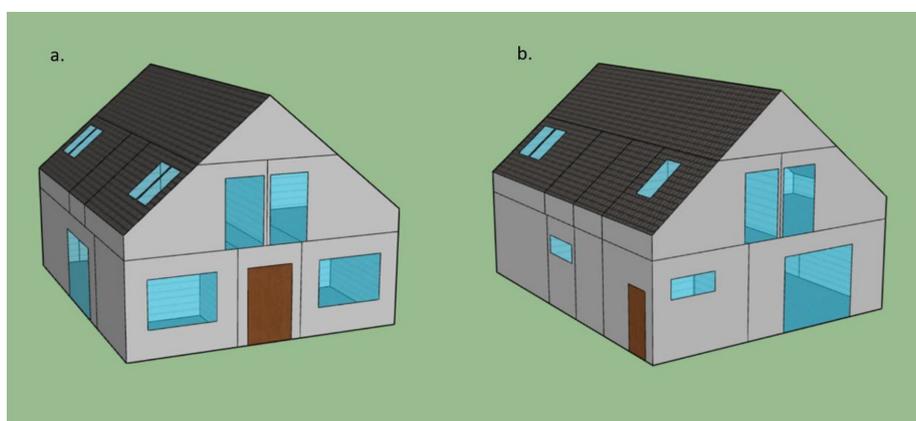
Three-dimensional visualization of the building created with SketchUp 2017: (a) view of the north-east elevation; (b) view of the south-west elevation
